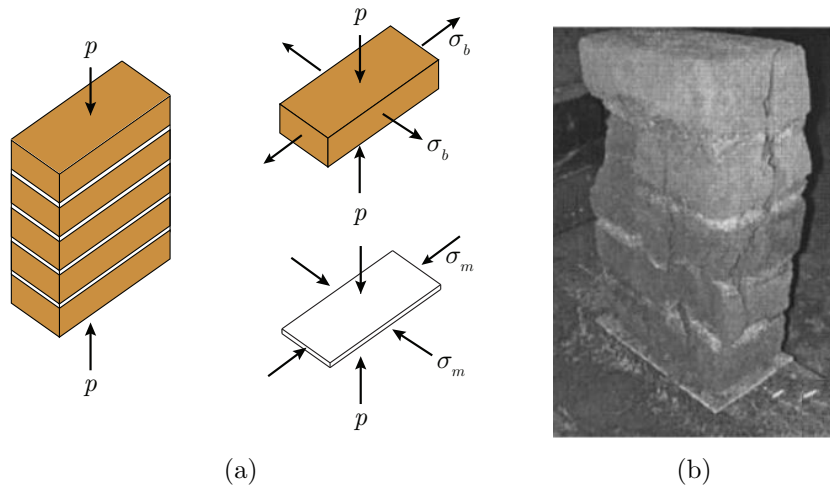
Compressive behavior for uni-axial load normal to bed joints: (a) state of stress in masonry constituents and (b) failure mode of a masonry prism.
